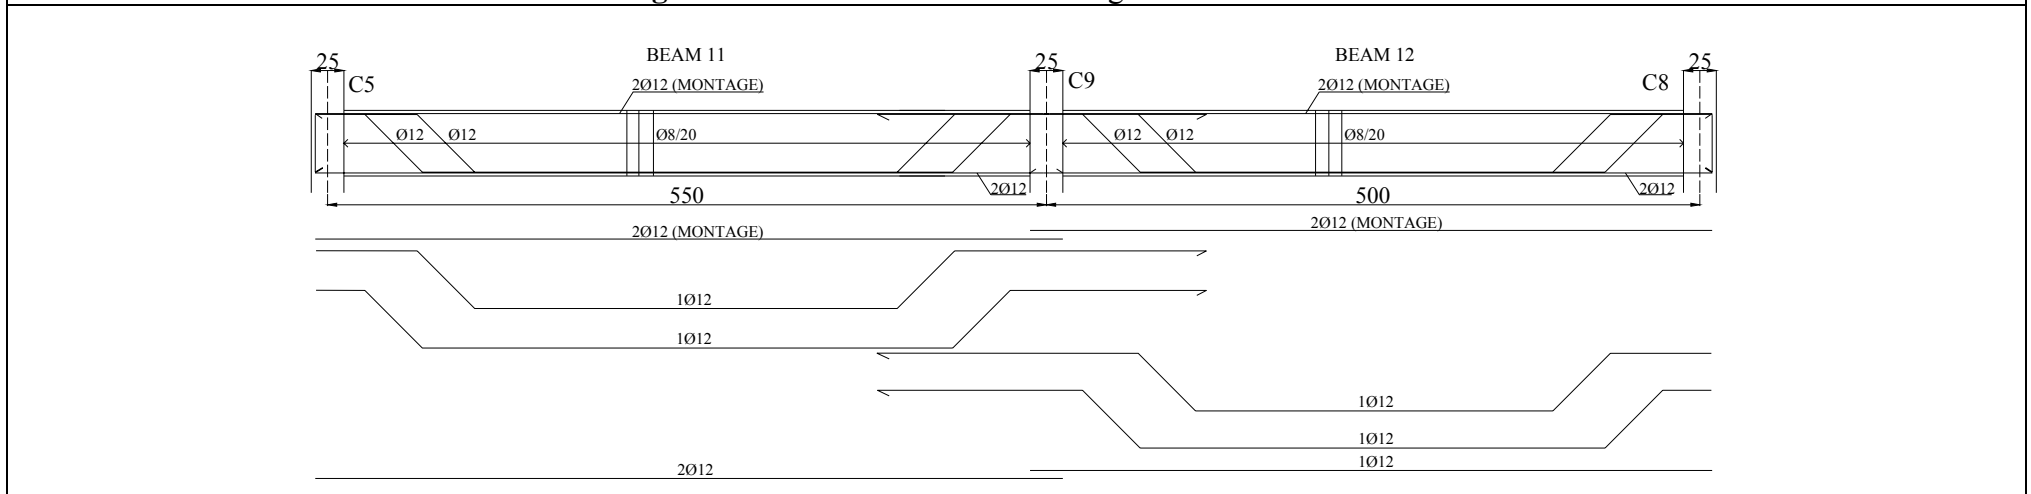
Beam 11 and beam 12 longitudinal reinforcement
